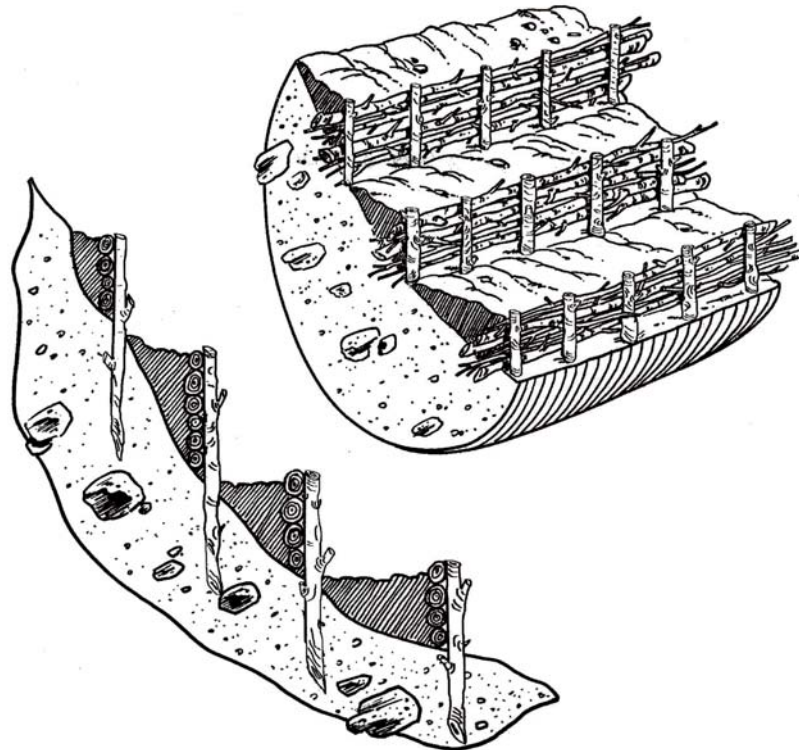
Wattle fences are short retaining walls constructed of living cuttings. They are used to provide slopes, which will support plant growth where oversteepened slopes are preventing plant establishment. The section shows the effects of steeper slopes on wattle fence spacing.
